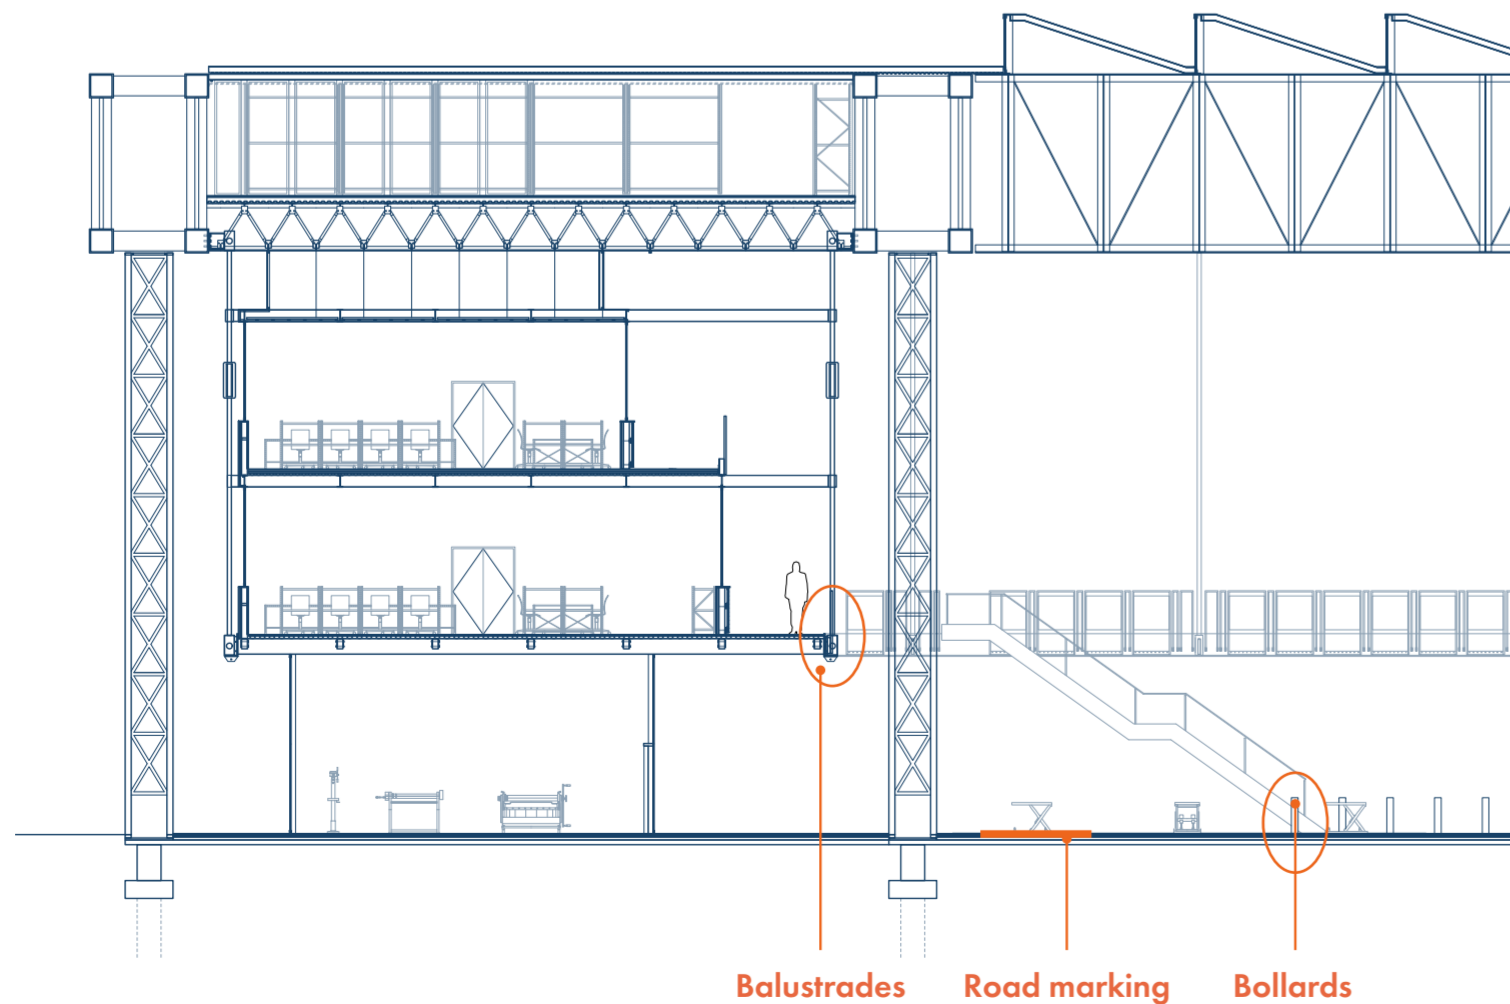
Detailed architectural section illustrating the spatial integration of native micro-urban elements—specifically balustrades, floor road markings, and safety bollards. (Drawing by author, 2025).
